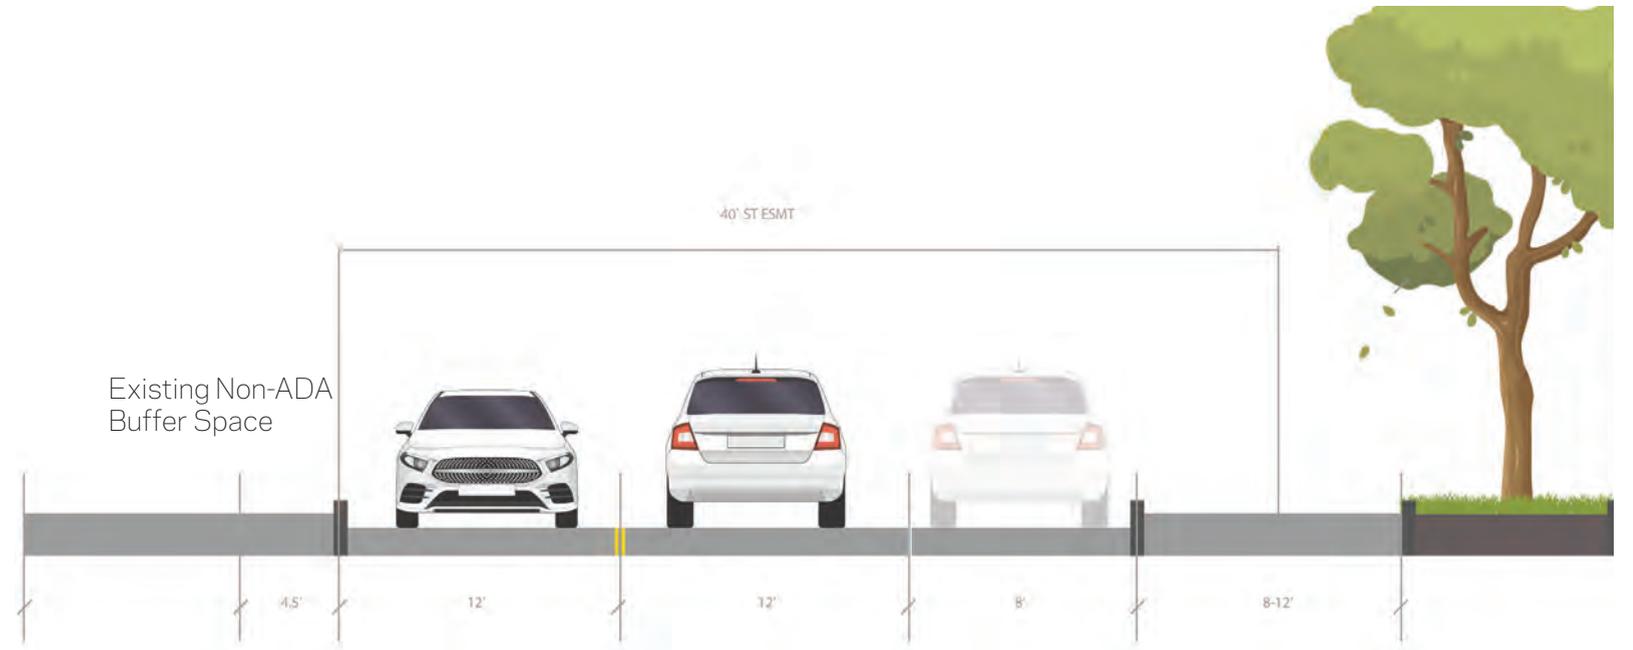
Proposed Cross Section for Southwestern Medical Avenue
